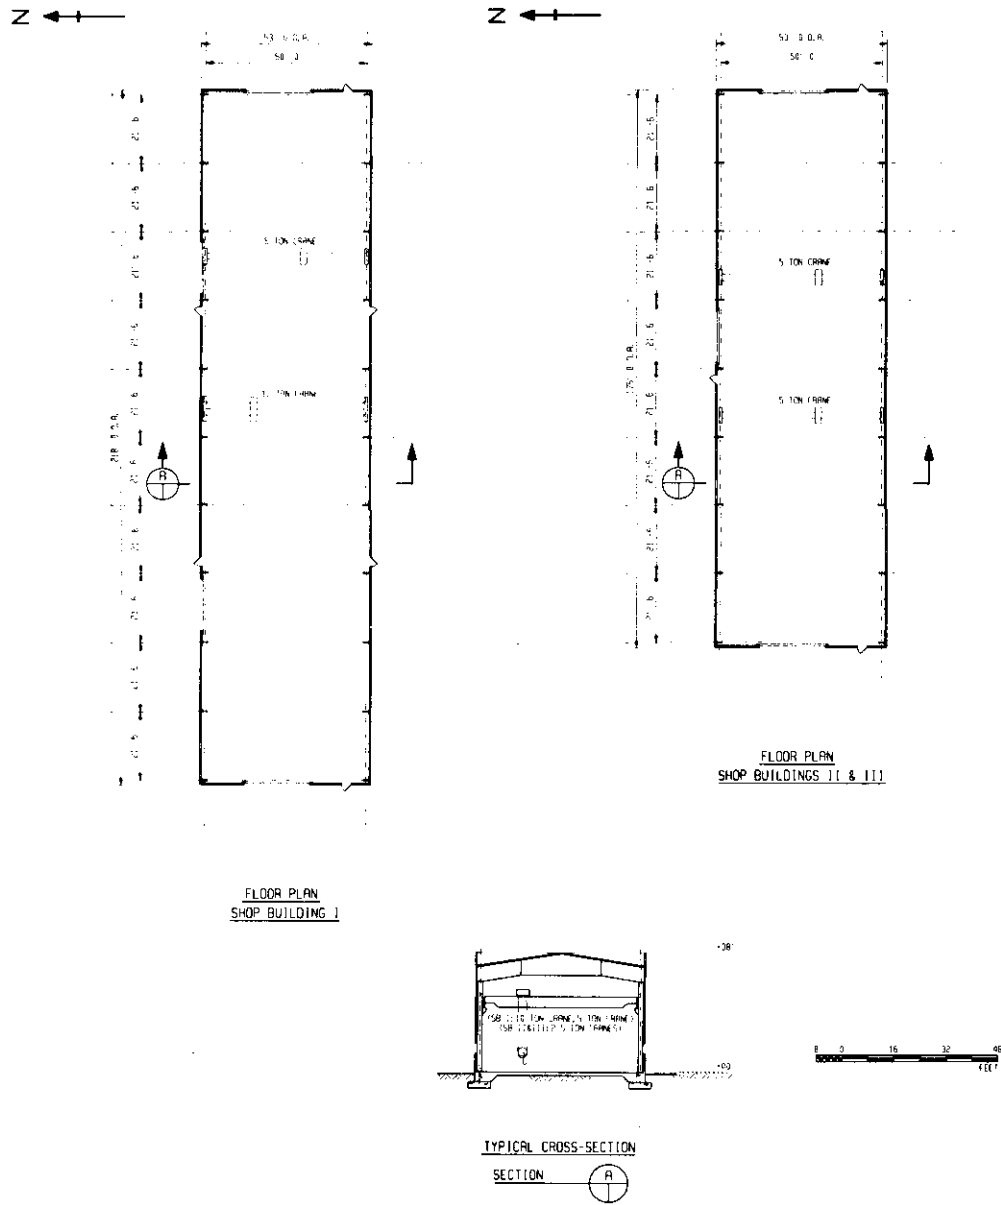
Floor plan of typical Shop Building showing work bay, office and toilet areas plus access doors.
